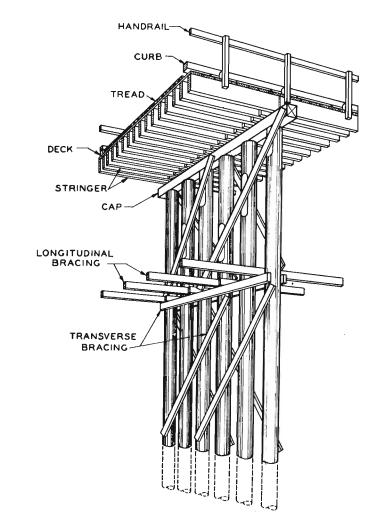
Highway bridge, class 50, double-lane, timber stringers on timber pile bent.
